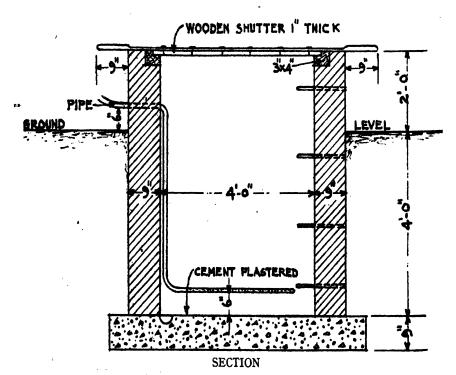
Type design of a lethal chamber for the destruction of dogs.
